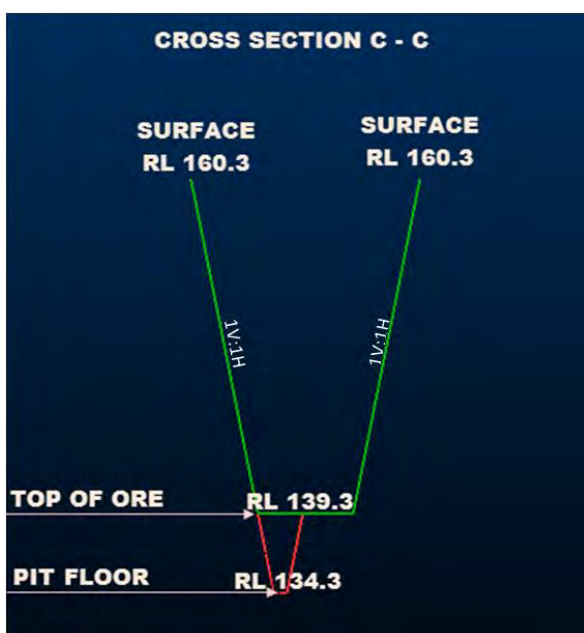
Cross section C-C at test pit (vertical exaggeration = 5.0)
